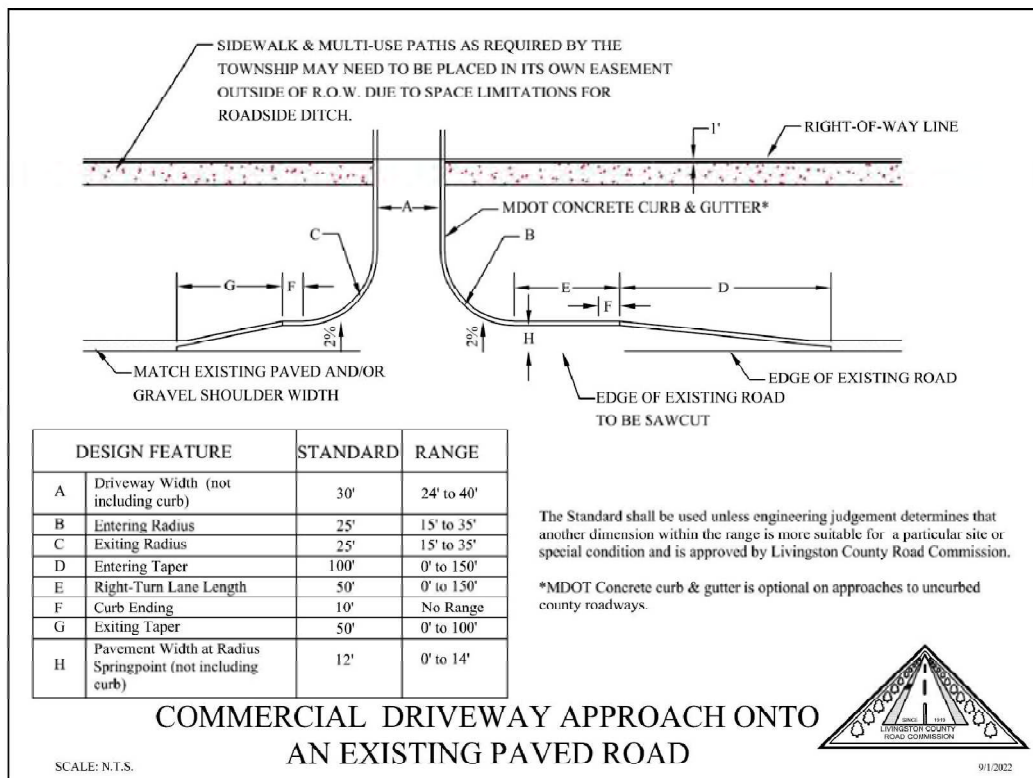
Commercial Driveway Approach Specifications (per Livingston County Road Commission)
